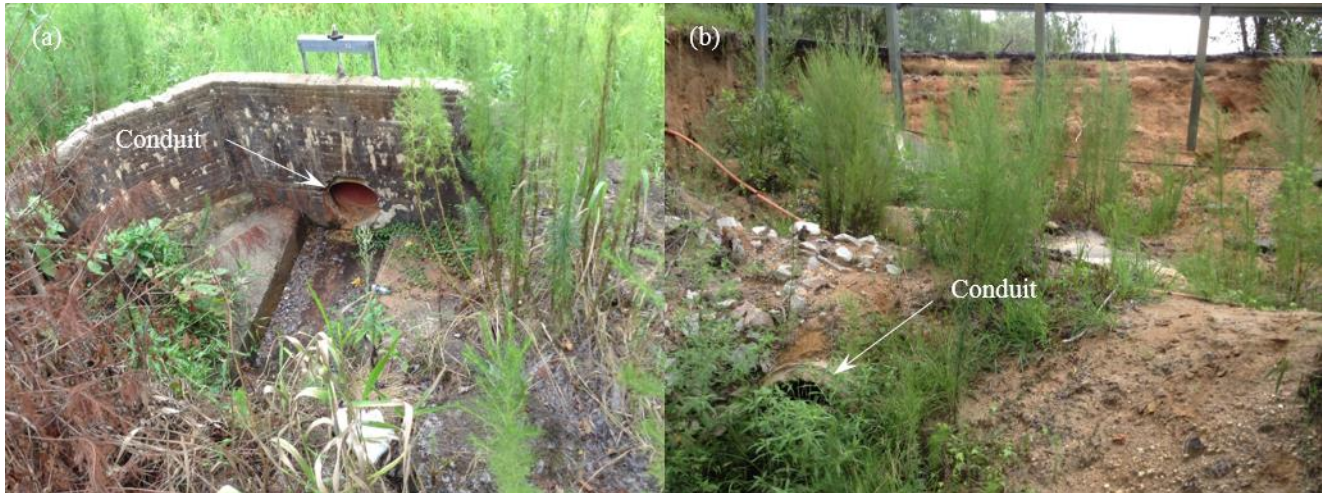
Spillway structure for Dam A: (a) conduit on upstream side (north view from SR-40-67), and (b) conduit and washed out soil above on downstream side (north view from downstream).
